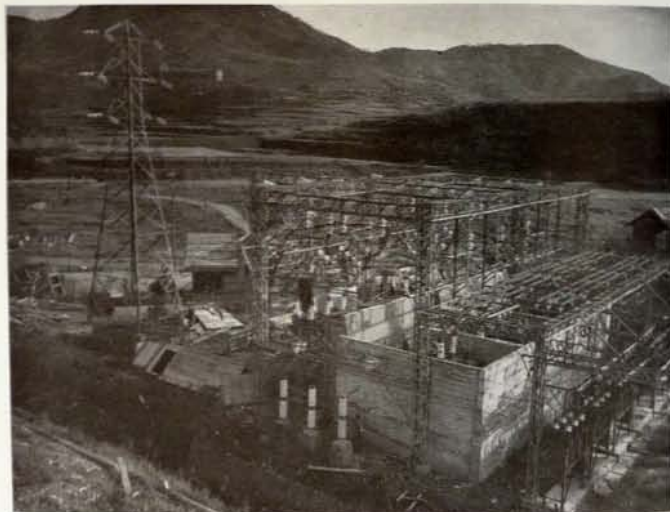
5,200 feet from GZ. General view, looking southeast, Urakami Substation.
